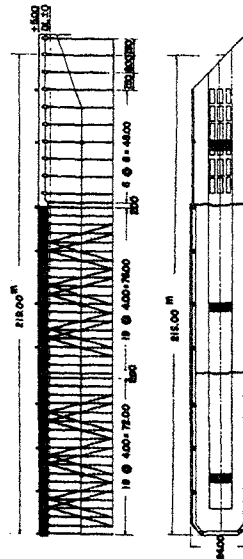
Longitudinal section and plan of the trestle type pier with reinforced concrete pilings.
